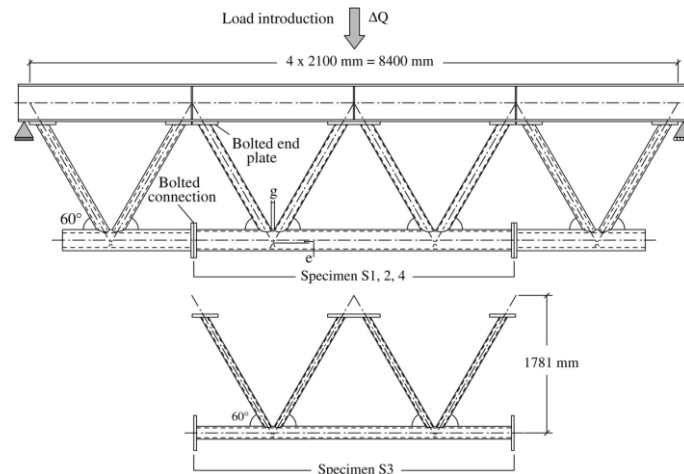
Truss girder tested by Schumacher, general geometric configuration and dimensions [70].
